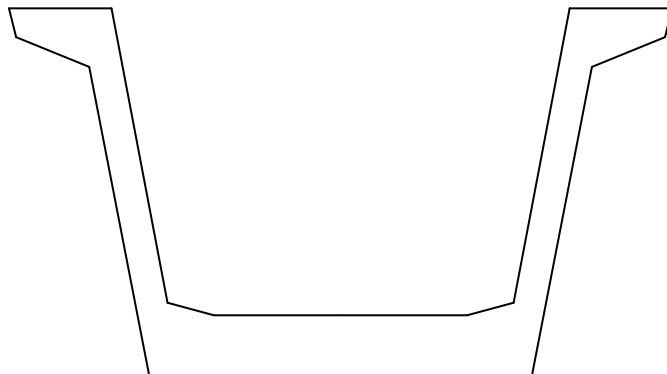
Cross-sectional geometry girders Artesa Series D.
